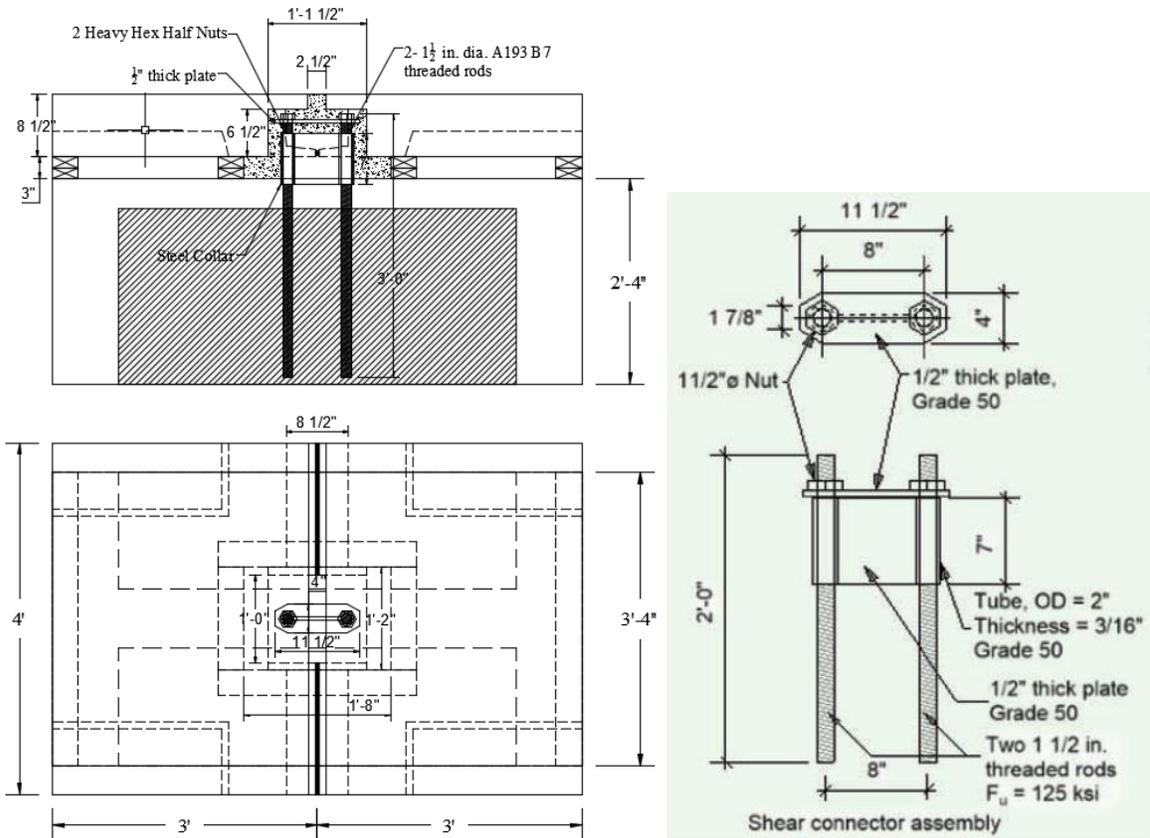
Push-off Test Specimen of UHPC Connection on Concrete Girder and The Connector Assembly (1in. = 2.54cm, 1ft = 0.3m).
